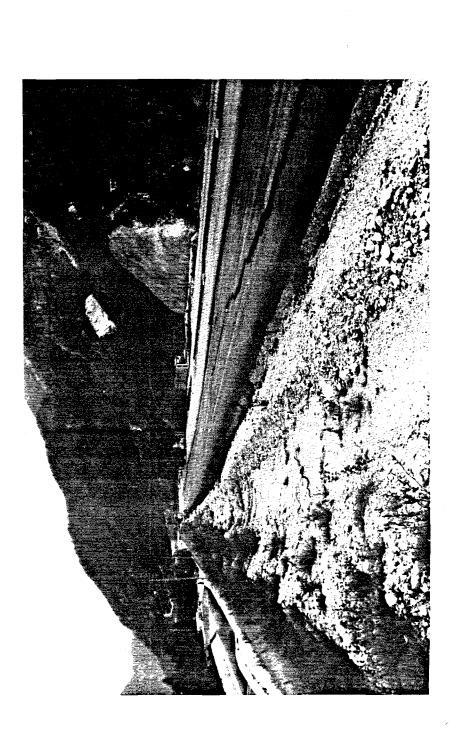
DAMAGE TO EMBANKMENT RETAINING WALL AND CANAL, UDINE-CARNIA-TARVISIO HIGHWAY - FROM (10)
